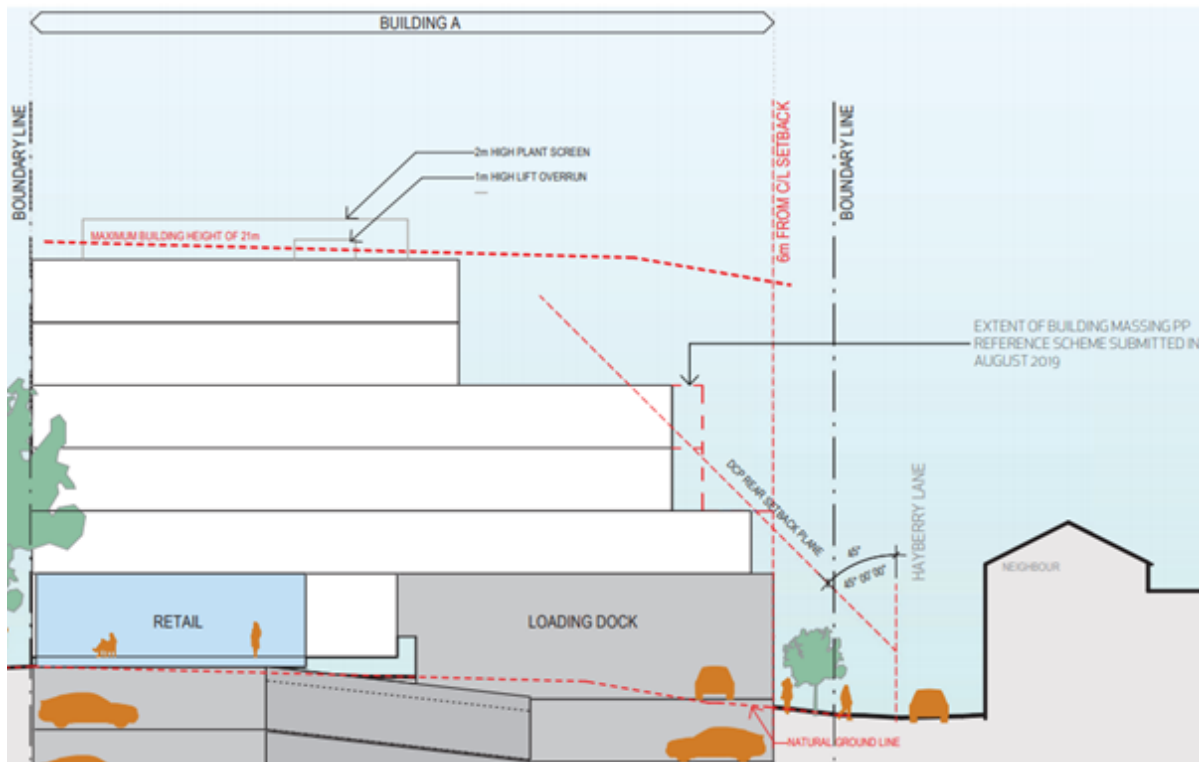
Section ‘A’ indicating relationship of proposed building ‘A’ to Hayberry Lane (looking east)
